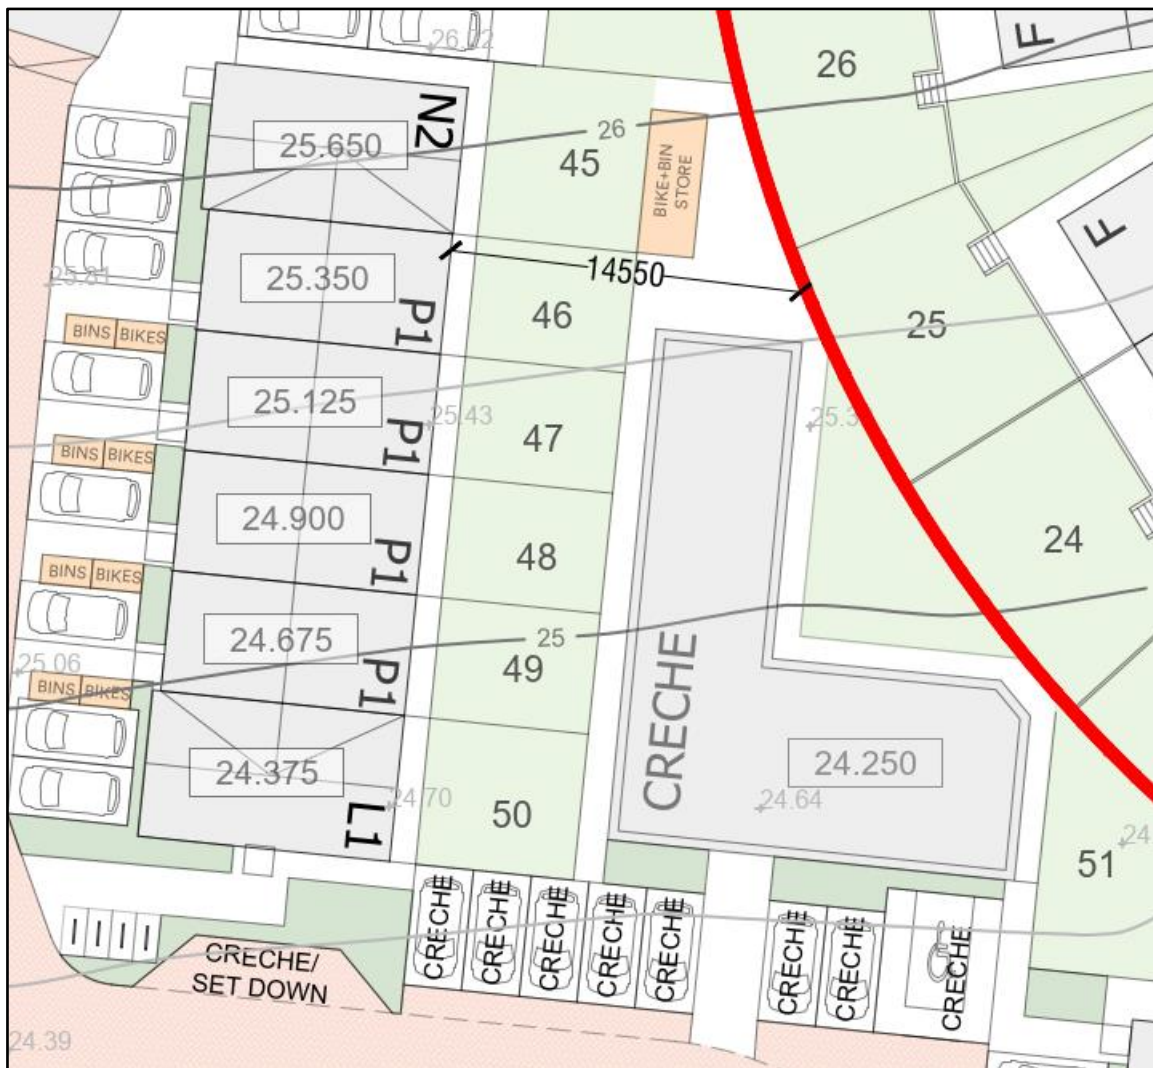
Extract from JFOC drawing no. 22.127.PD1003: Phase 2 Site Layout Plan
